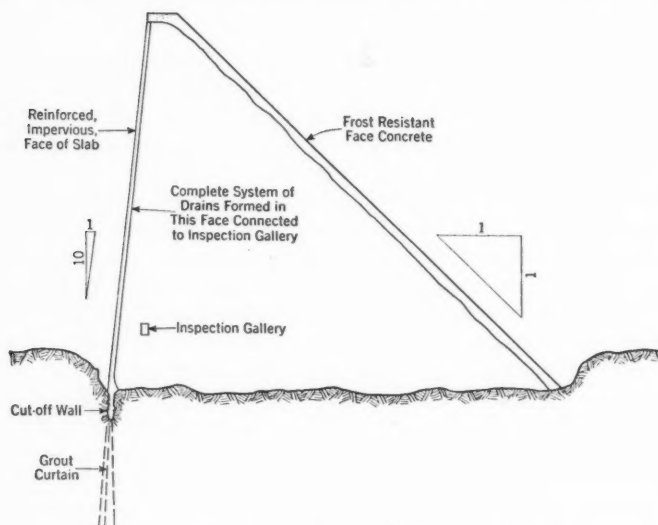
TYPICAL CROSS SECTION, CONCRETE FILL DAM
